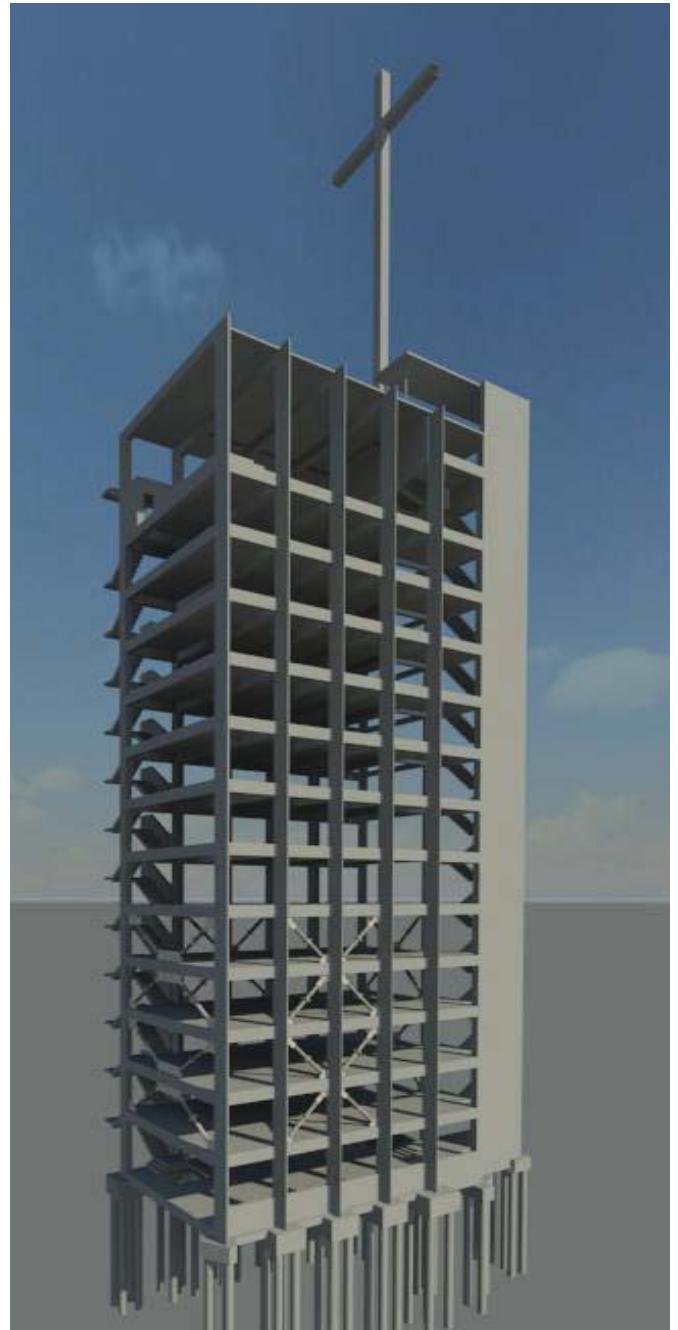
Structural model of the Tower of Hope with dampers on second through fifth floors.
